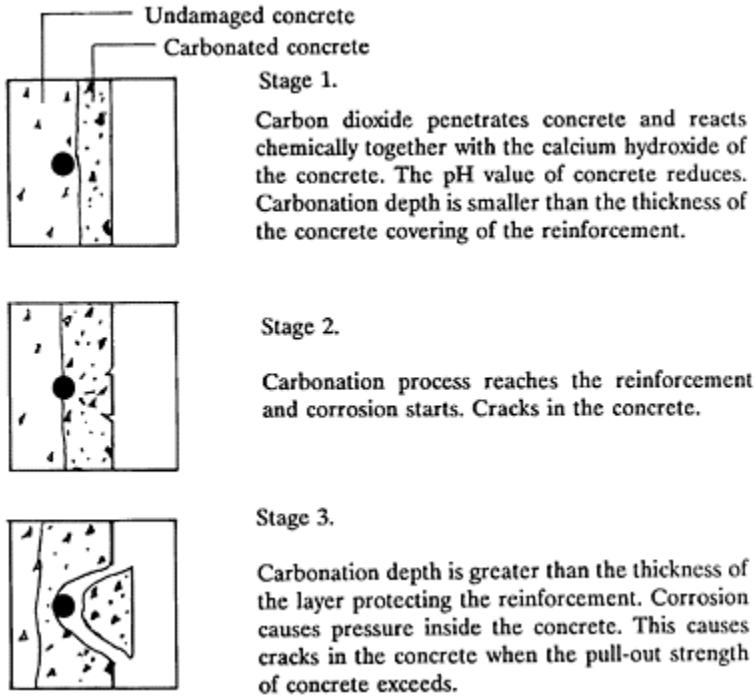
Mechanism of a damage to a functional element; peeling of concrete caused by corrosion of the steel reinforcement in the concrete.
